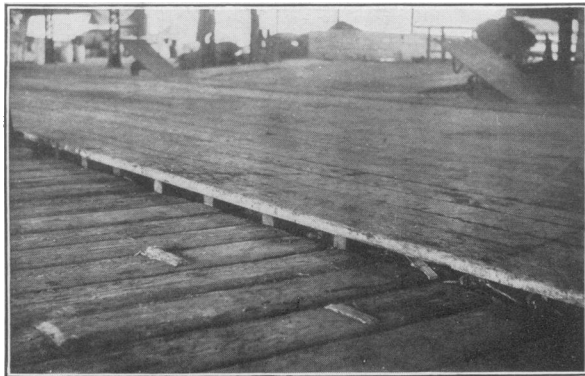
VIEW SHOWING OPENINGS IN SHED FLOOR.
